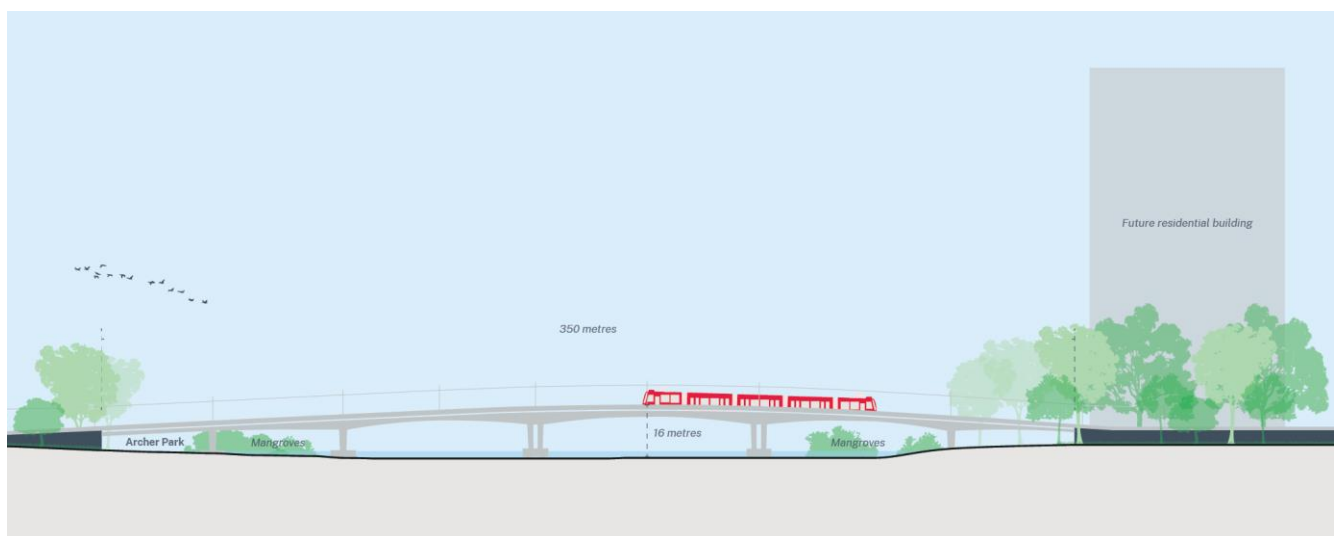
Indicative elevation of bridge between Melrose Park and Wentworth Point (viewed from the west)
